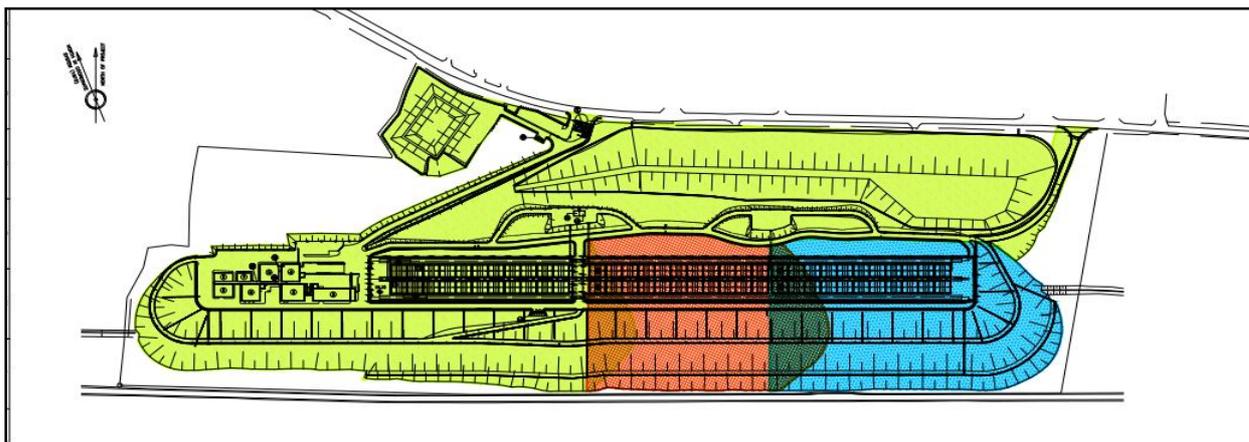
LAYOUT OF THE TRENCH TYPE STORAGE
